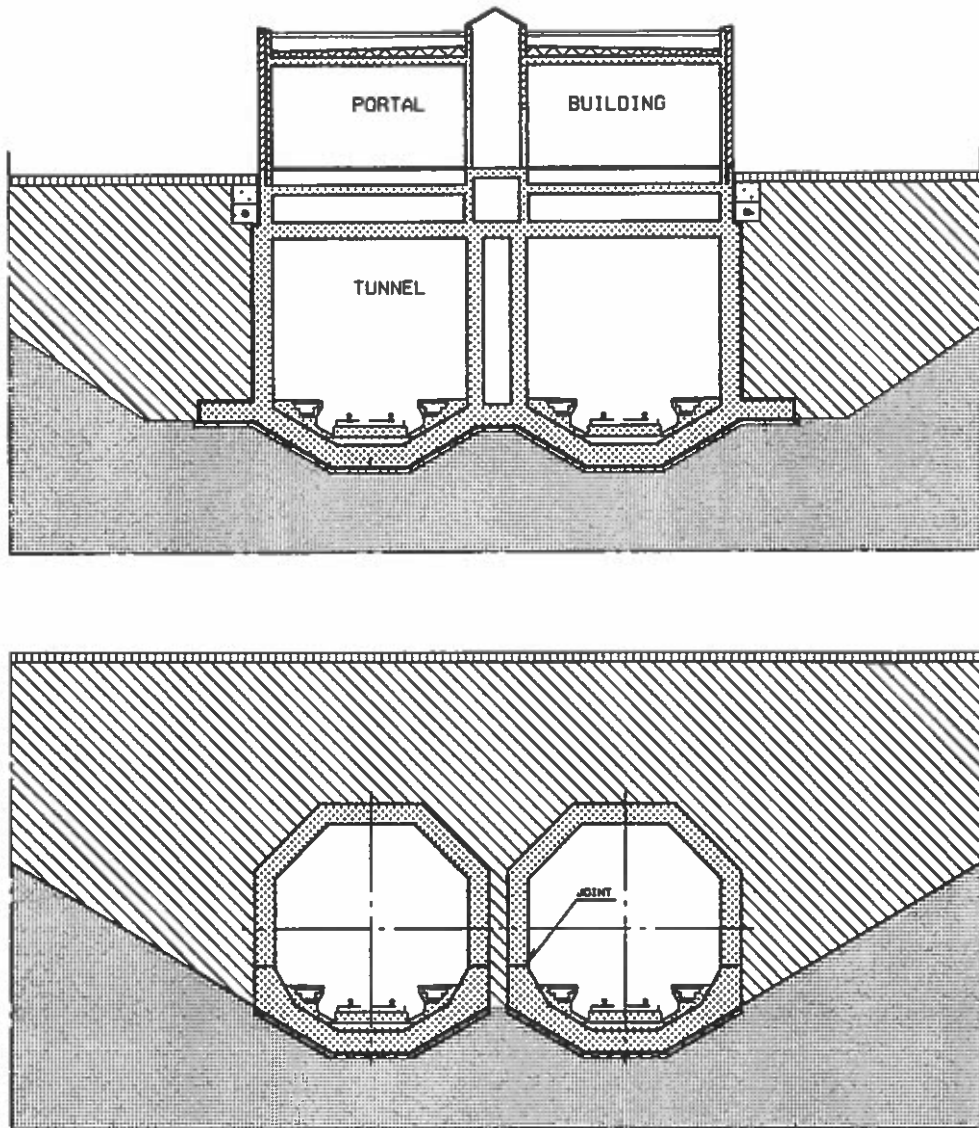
Section in Portal Building and Cut & Cover Tunnel
